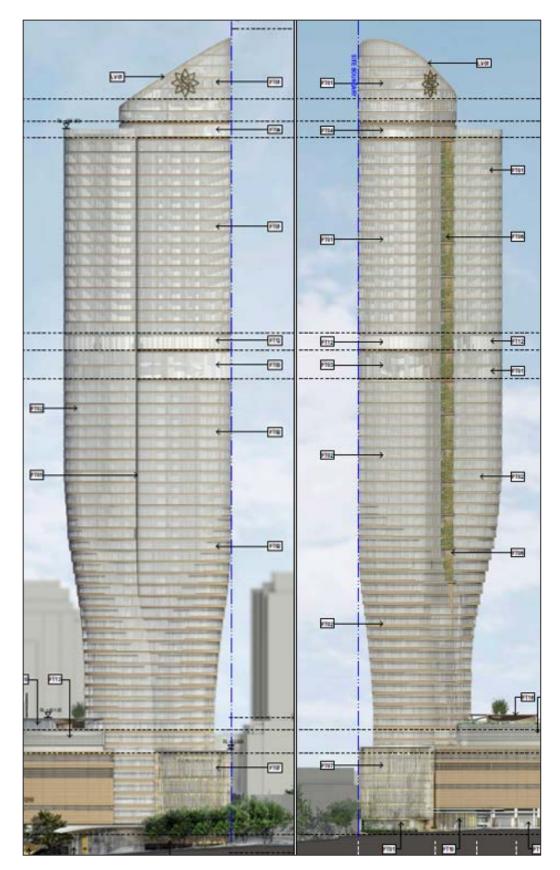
| Pirrama Road (left) and Jones Bay Road (right) tower elevations (Source: Proponent's Architectural drawings)
